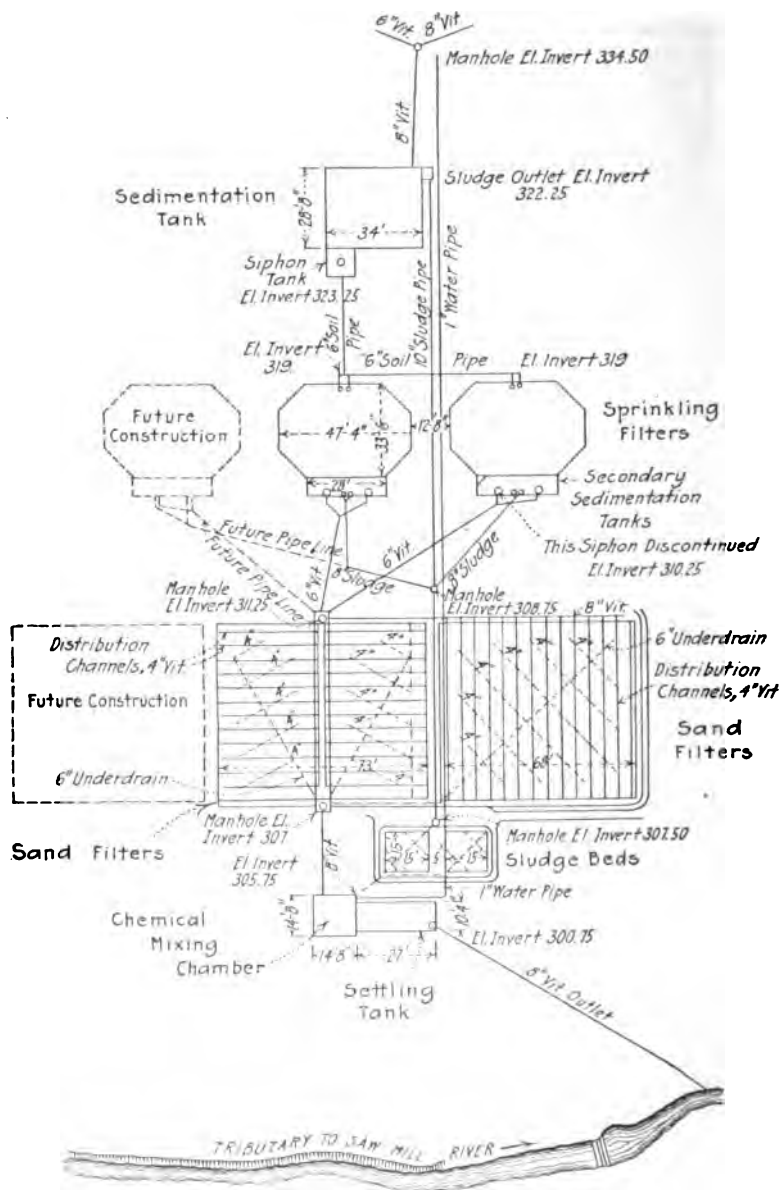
Sewage treatment plant, Hebrew Sheltering Guardian Orphanage.
